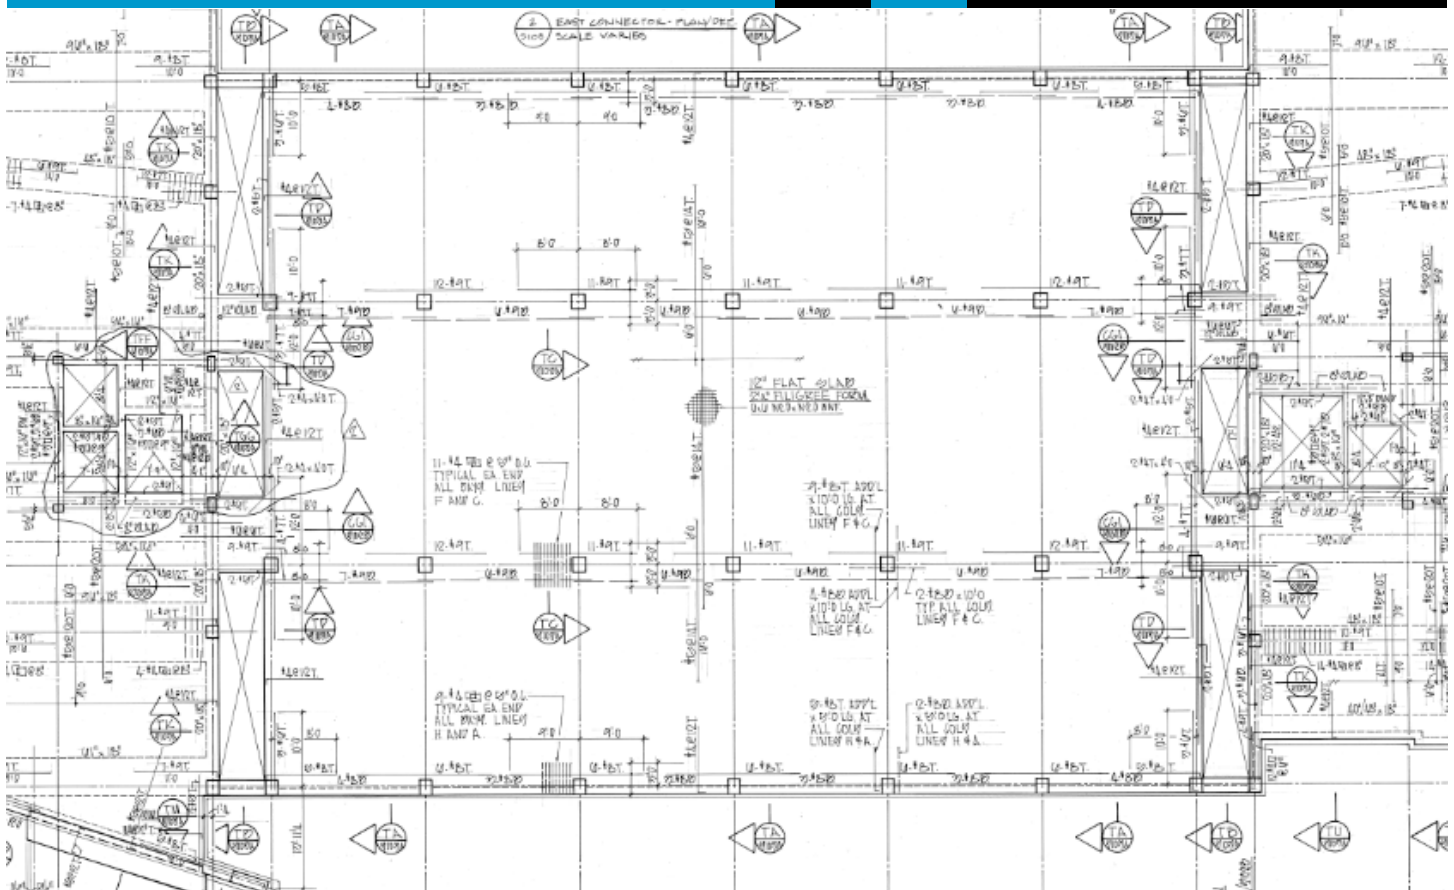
Typical Floor Plan - The three vertical openings on each side are for HVAC, electrical, and mechanical usage, and the openings just to the outside of these openings are elevator shafts.
